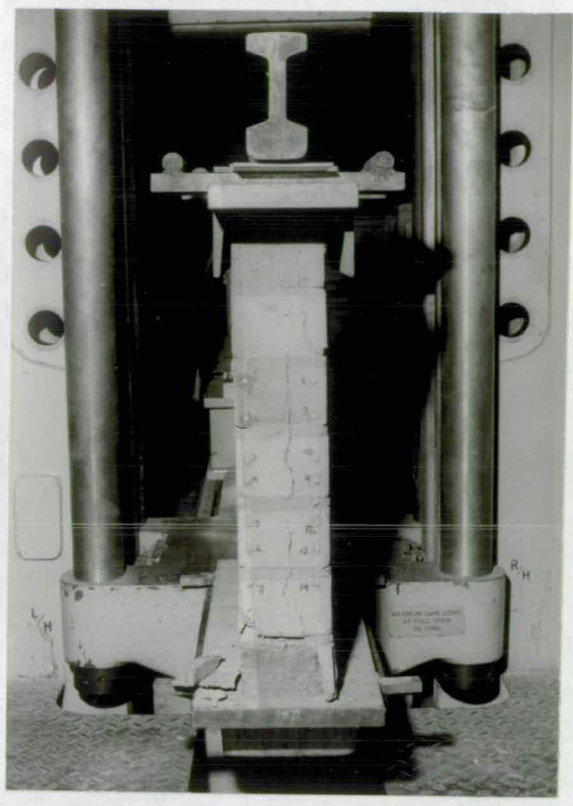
Vertical Cracks at Failure of a 1:1/4:3 Mortar Wall - No 4
